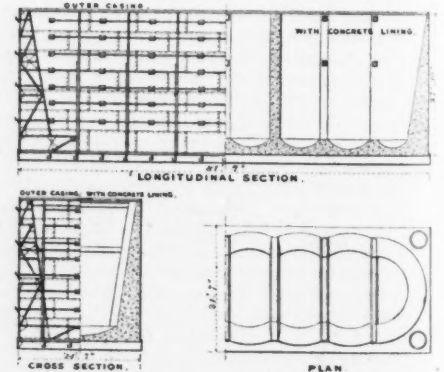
Details of Caisson for 3,000-ton Concrete Block in Breakwater Foundation.
